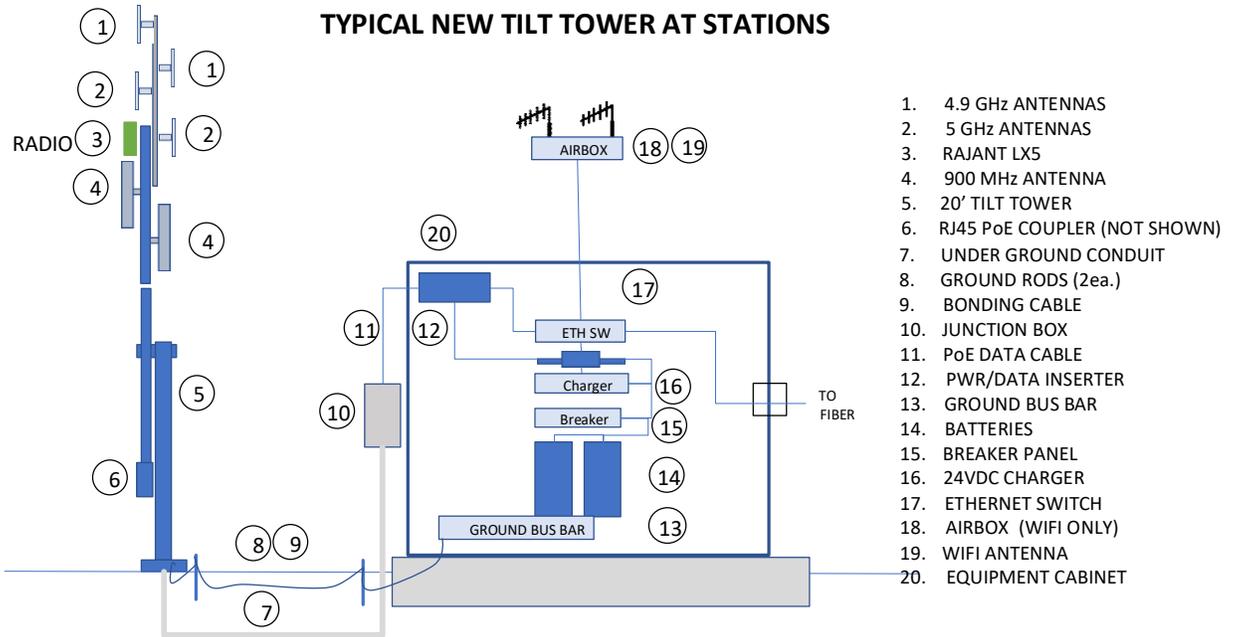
TYPICAL TILT TOWER AT STATIONS
